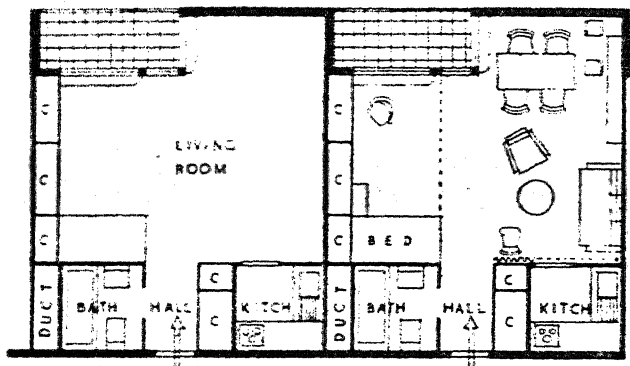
Miss M. E. Lloyd's Plan for quiet Bed-sitting Room Flats.
